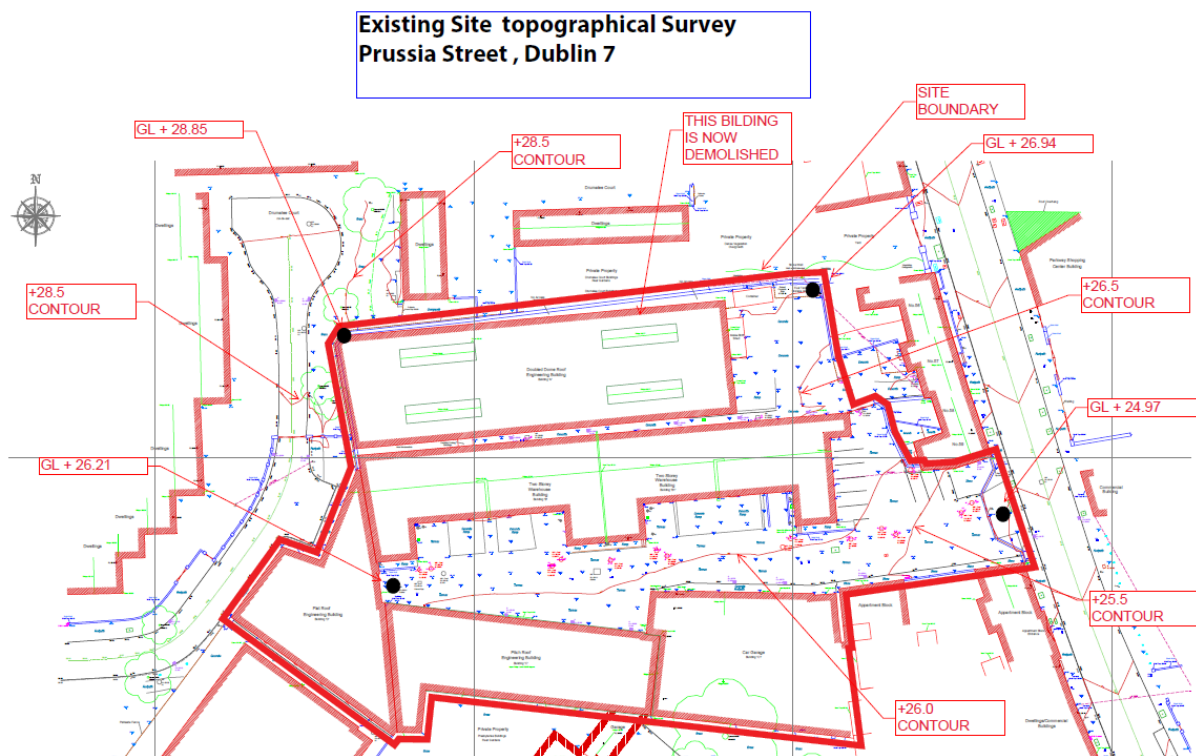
Existing Site Topographic Survey plan with ground levels indicated
